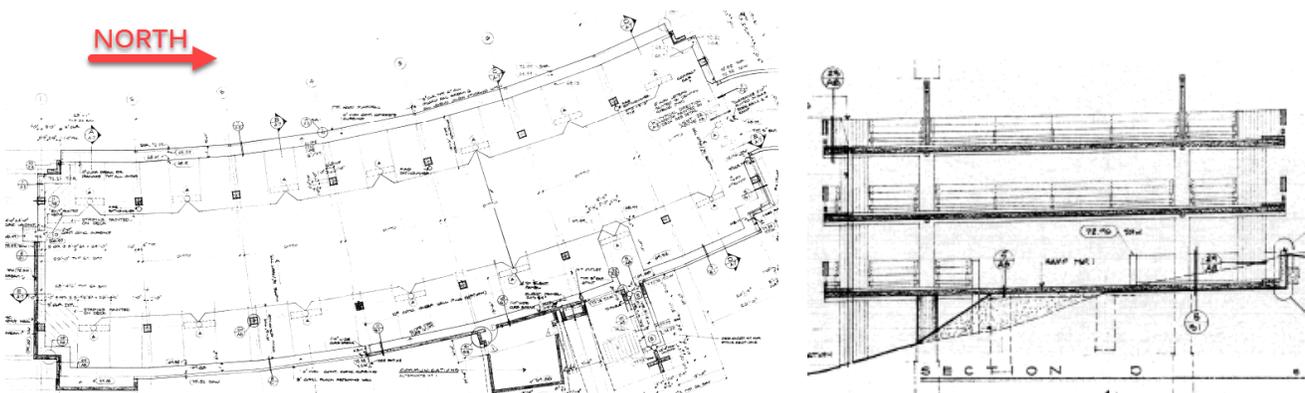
Plan view of Parking Garage (left); Section through Parking Garage looking north
